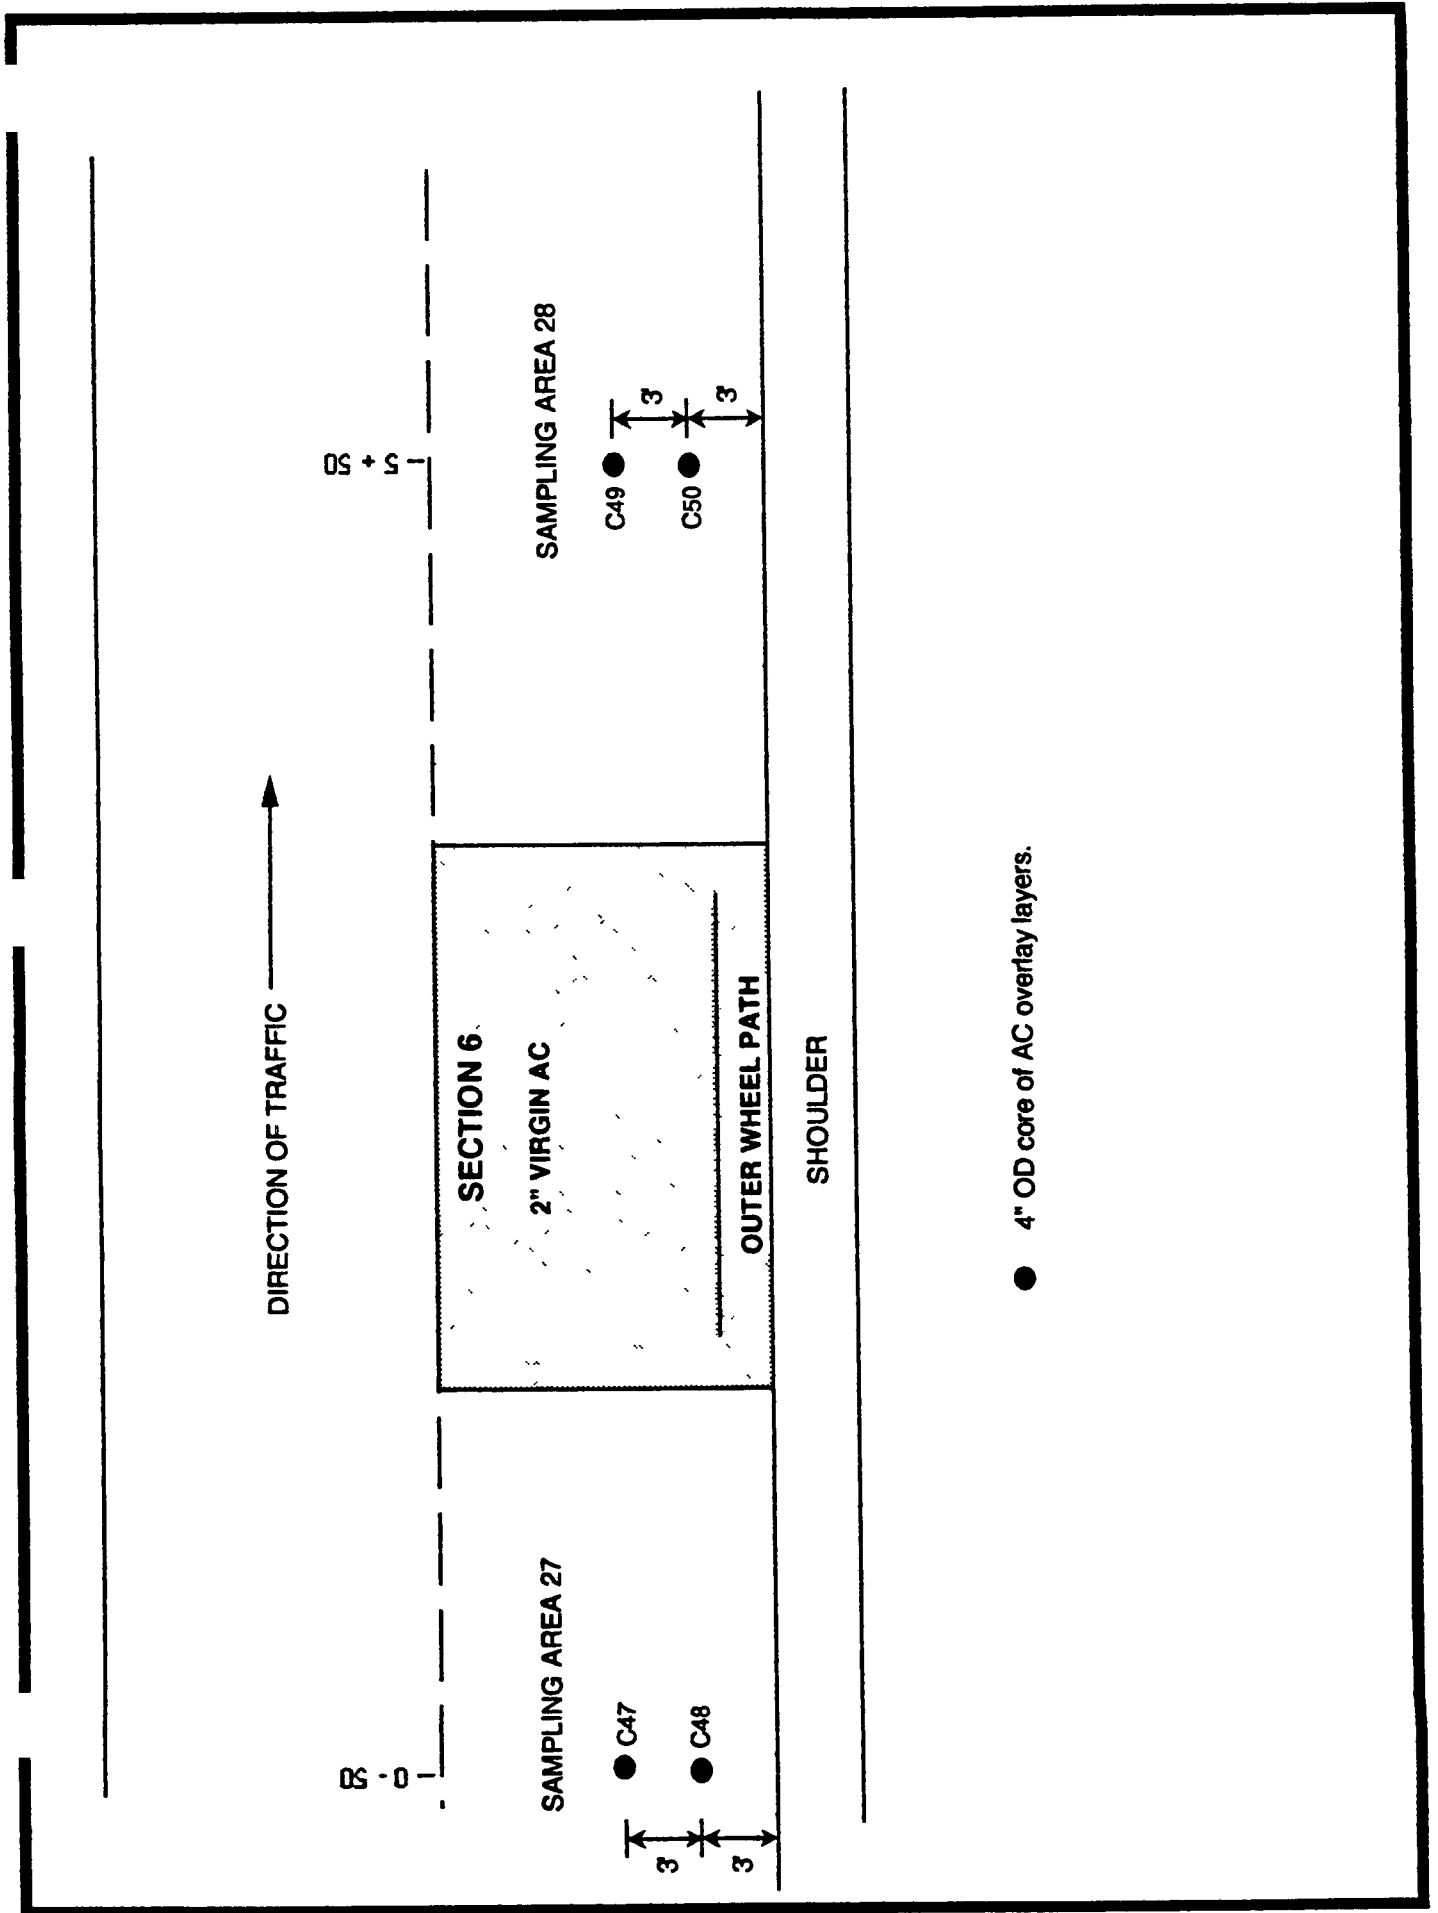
Example of 'Post-Construction' Sampling Plan for Section 6.
